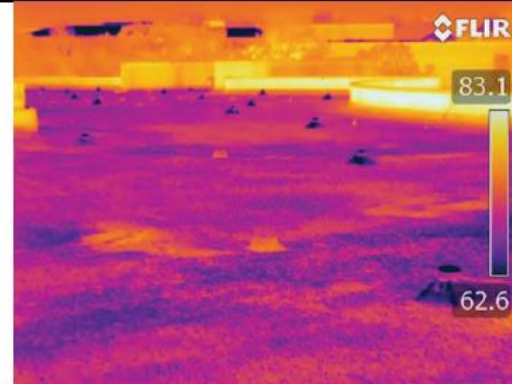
Various thermal anomalies throughout the roof area looking west along the center section of the roof area.
